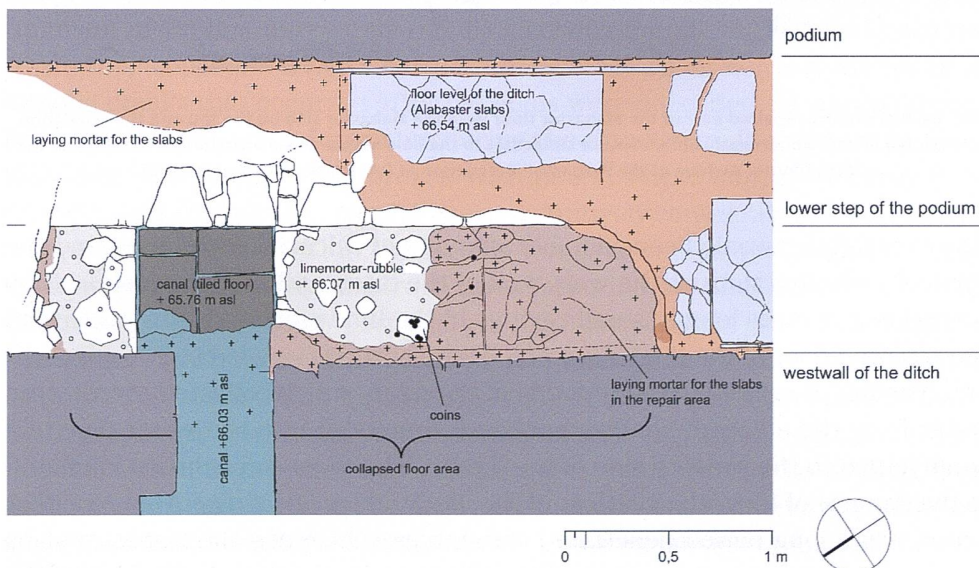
Plan of the collapsed floor area with the coin deposit (Drawing: U. Mania 2003/2025).
